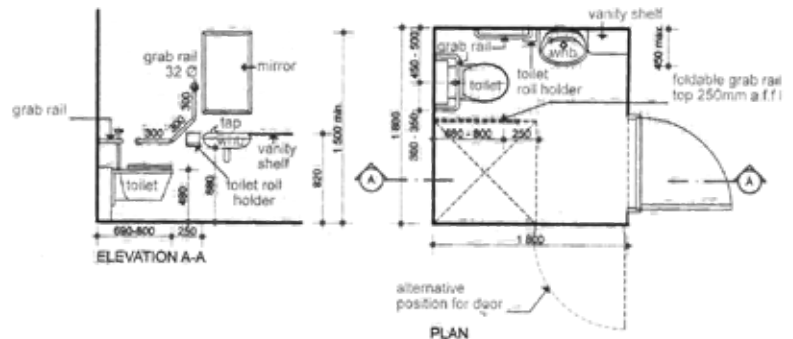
Floor plan and elevation, disabled toilet (Muller, 2013: drawings).
